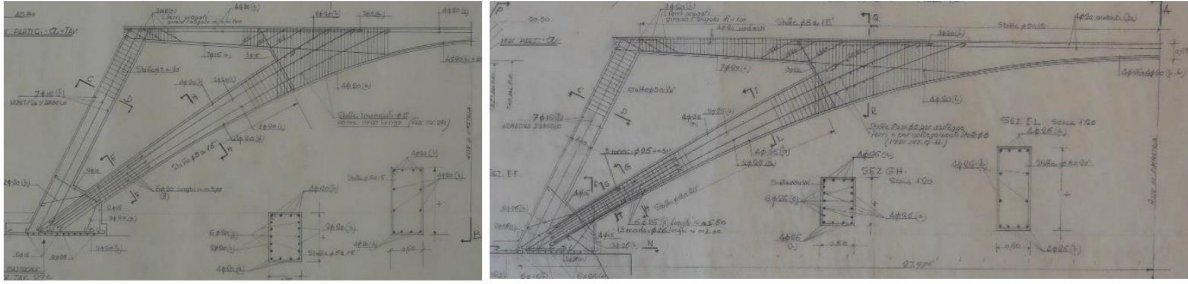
original drawings of the short bow (left) and longbow (right) reinforcement design [27]
